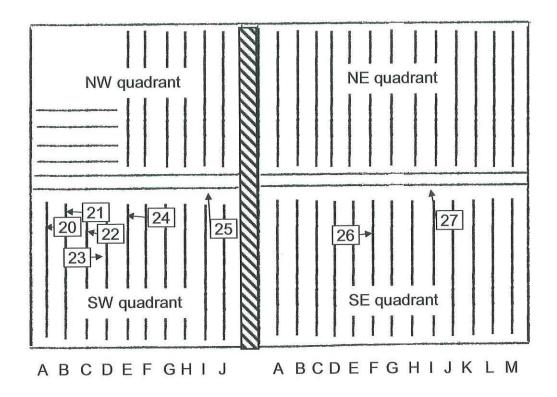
Simplified sketch plan of the Governor's Room roof at Holy Cross church, Crediton, Devon. The labelled arrows indicate the sampled timbers visible on this plan
